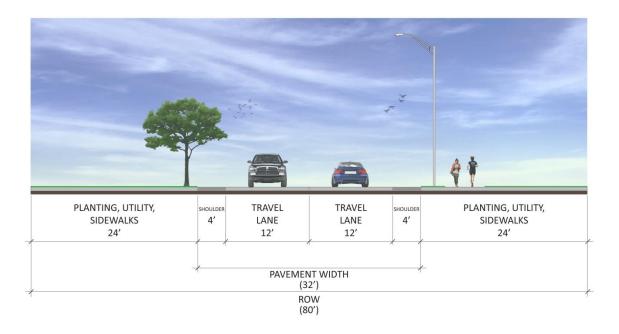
Proposed Rural Arterial Cross-Section
